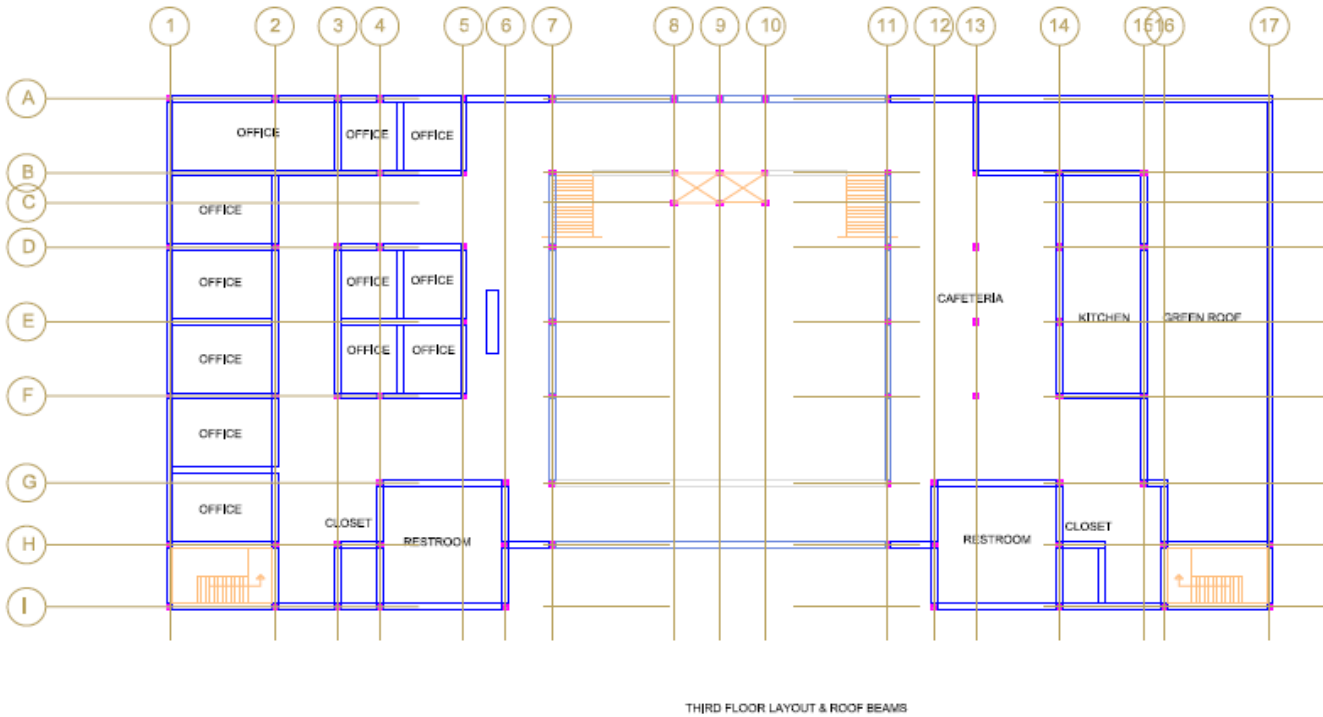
The third floor of the building is proposed to have a cafeteria with an outdoor patio, 12 offices, 2 storage closets and 2 restrooms
